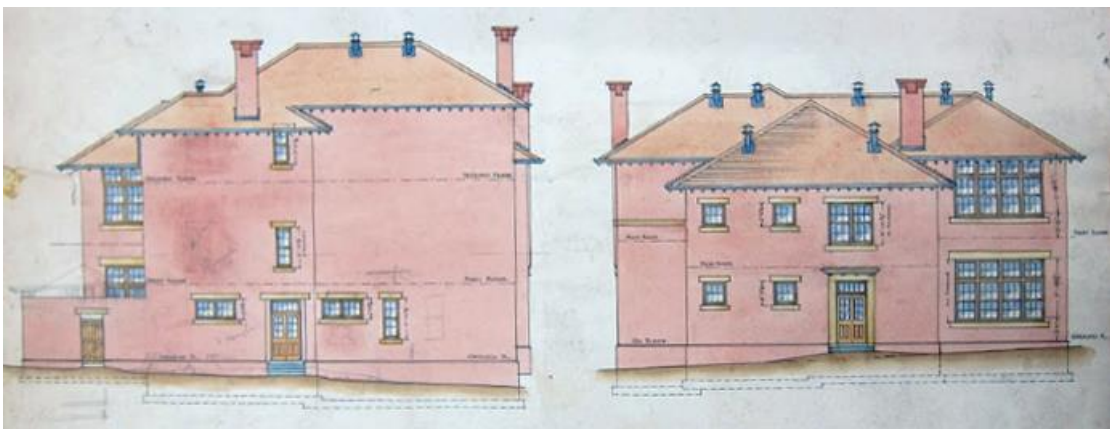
West (3-storey) & East elevations (2-storey), 1922 (Source: VPRS 3686/P6/3096)
